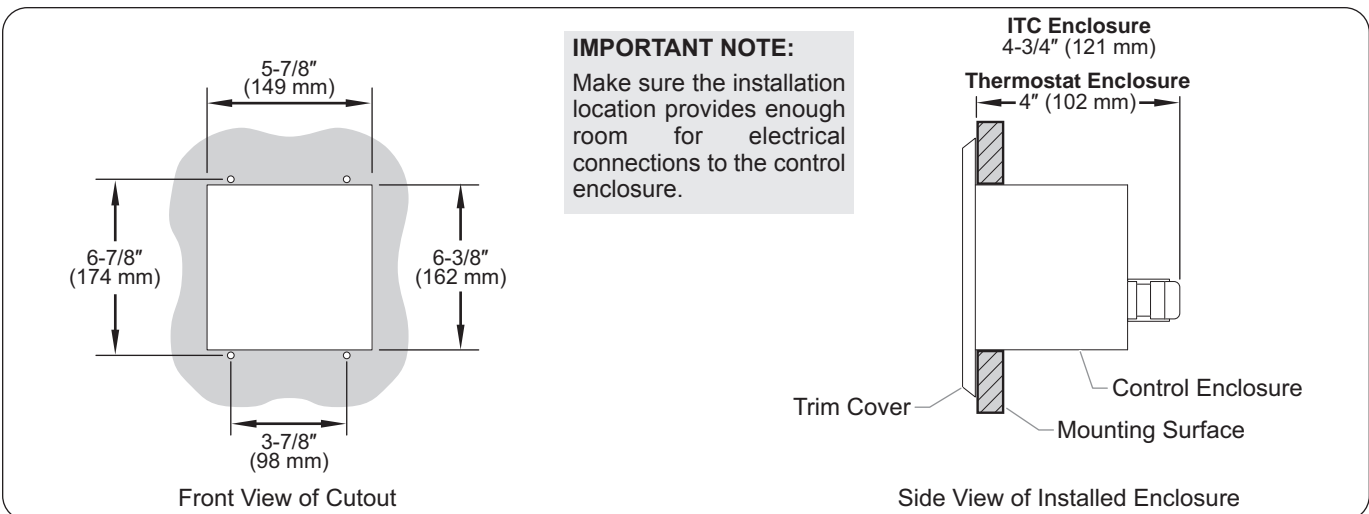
Remote Mounted Control Enclosure Installation Dimensions
